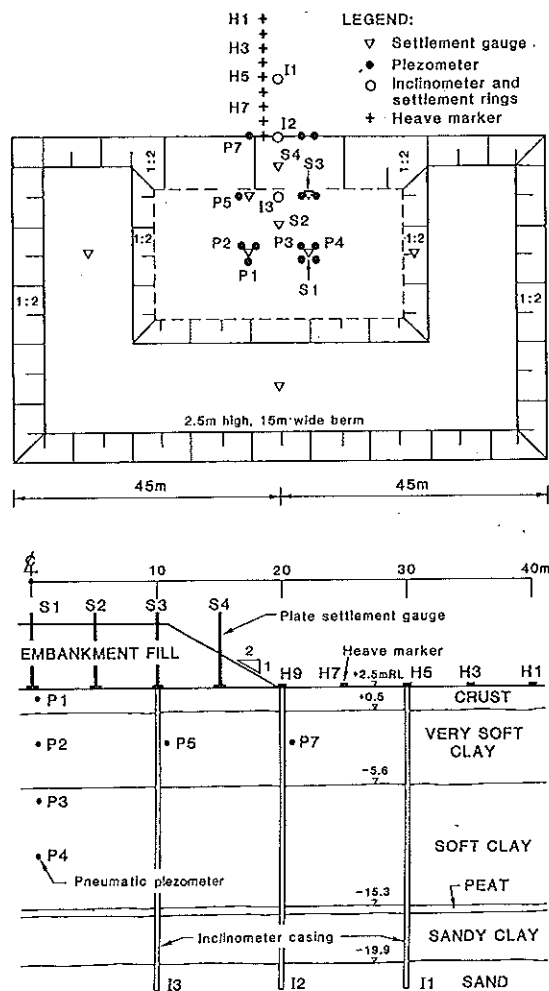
The test embankment showing the positions of key instrumentation: (a) plan, (b) cross-section through centre
